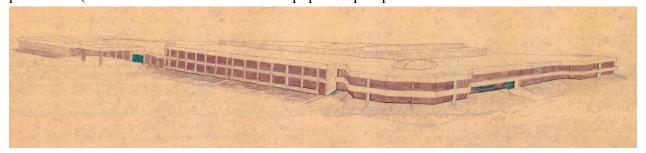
A sketch of the Figure 8-23 plan, looking northwest
